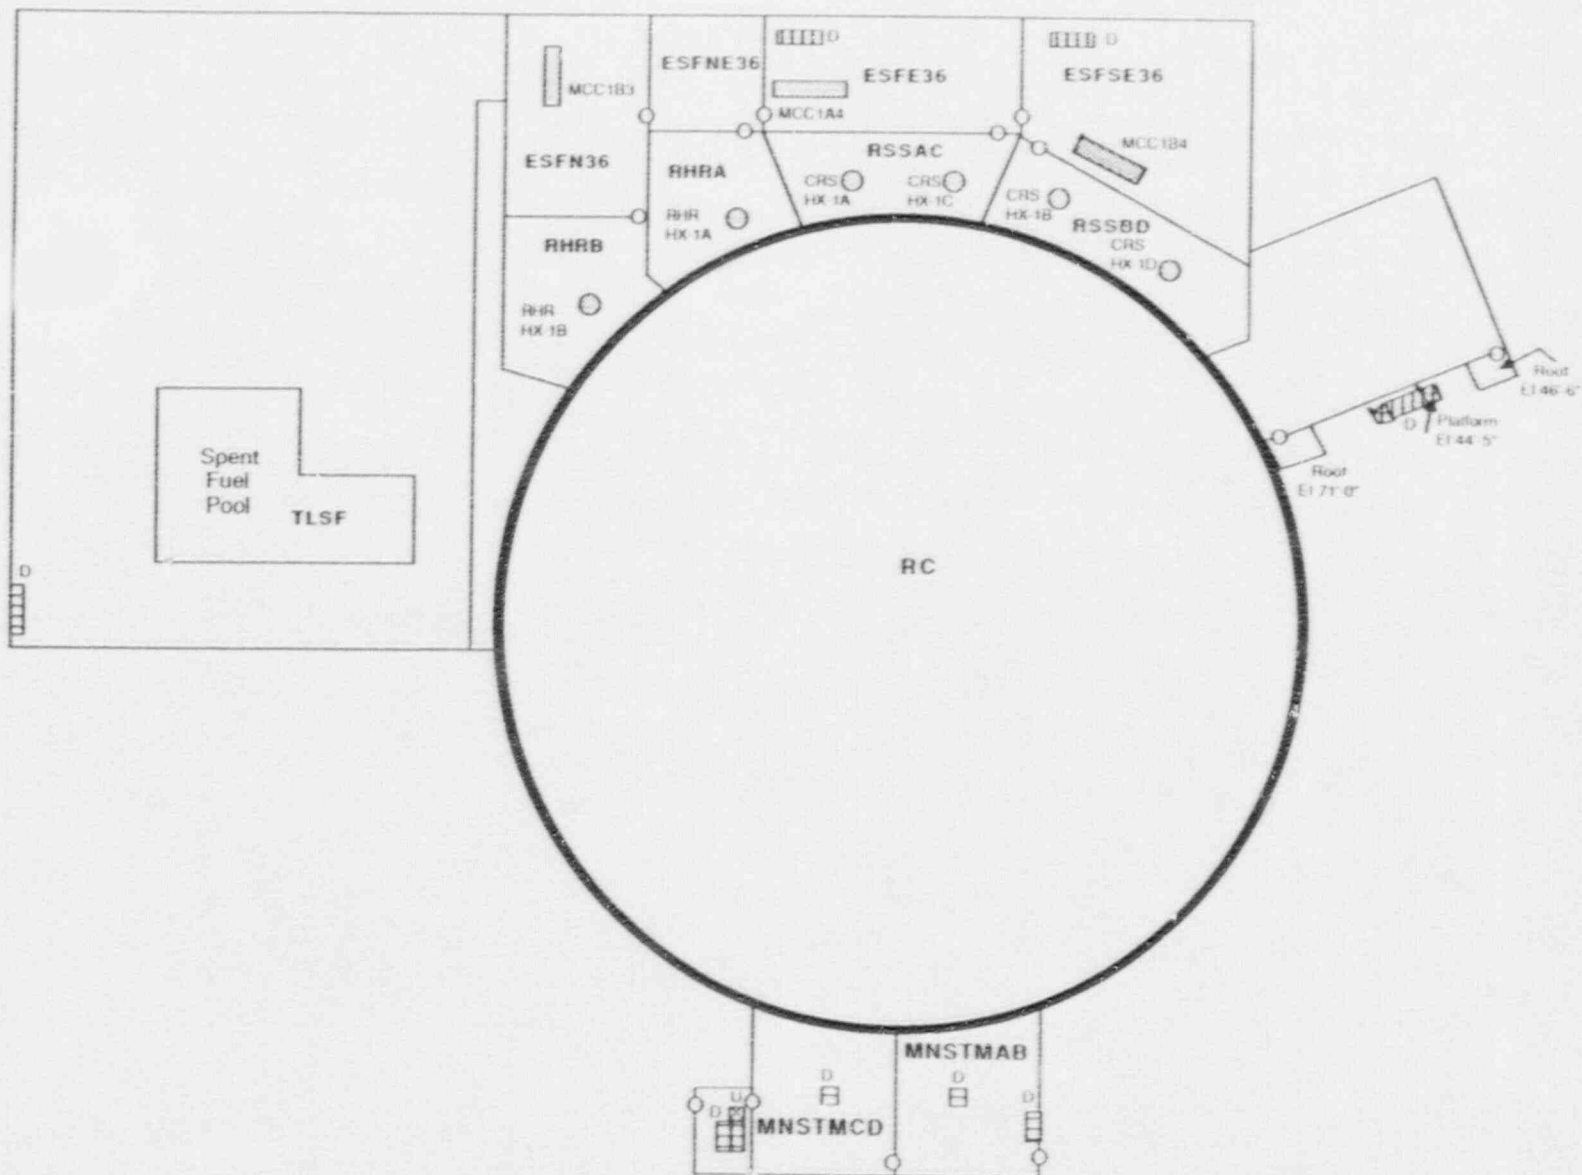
Millstone 3 General Arrangement, ESF and Fuel Buildings, Elevation 51'-4".
